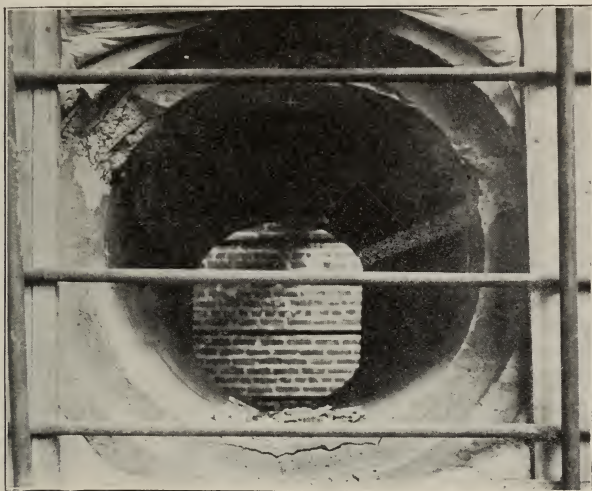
VIEW OF REINFORCED CONCRETE PIPE AFTER TEST.
